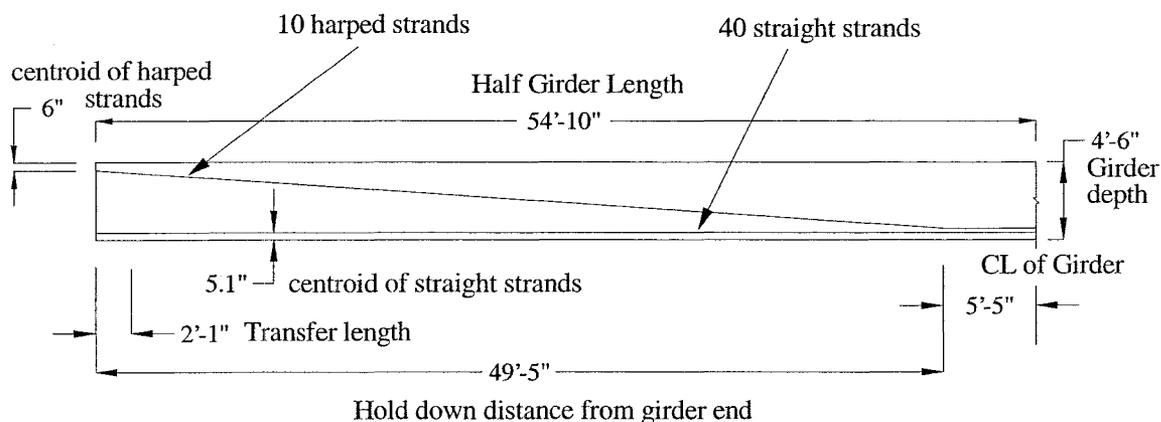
Longitudinal Strand Profile (half of the girder length is shown)
